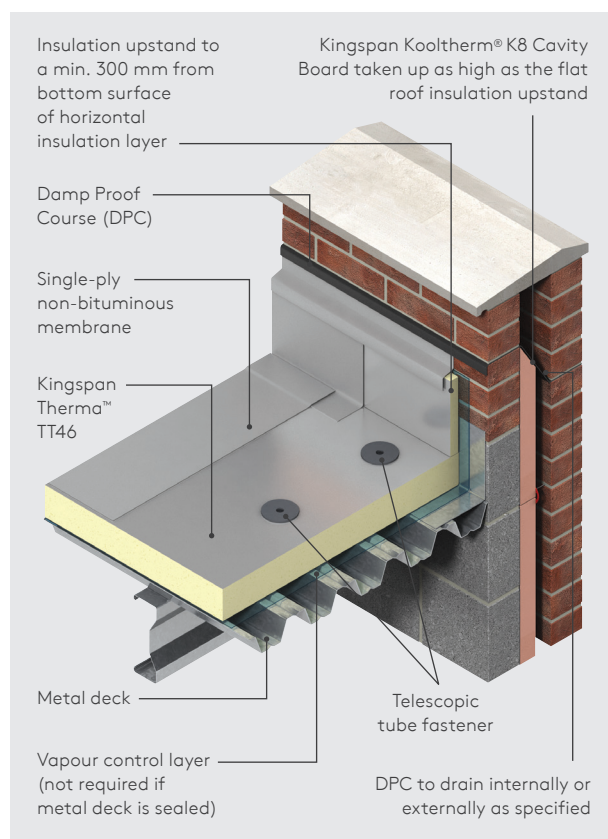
Kingspan Therma™ TT46 in a Metal Deck with No Ceiling.
